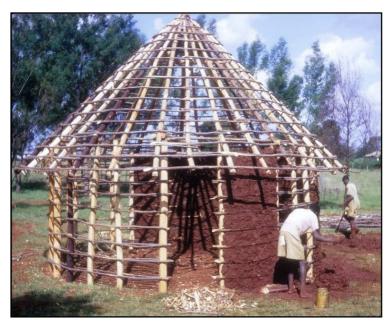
Timber Posts Used as Columns and Beams in Igala Traditional Building Construction.
